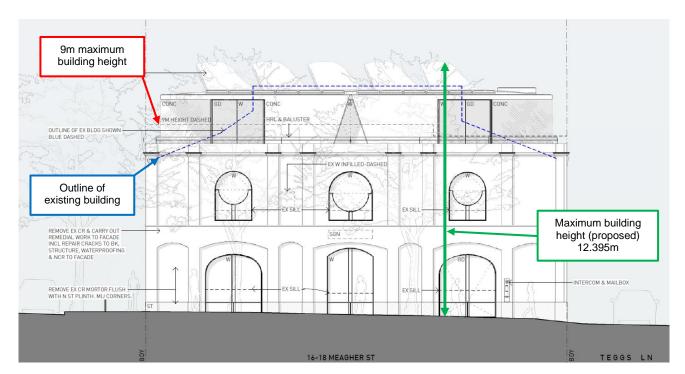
Balfour Street elevation showing proposed building, height limit (red) and existing building (blue)
